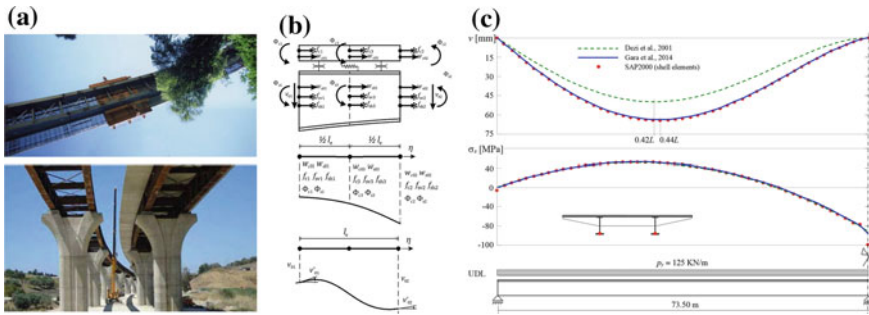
a Traveling formworks for the slab casting in steel-concrete composite viaduct; b 25 dof finite element for the higher order model of composite bridge deck; c Results of different modelling of a twin-girder composite deck under uniformly distributed load
